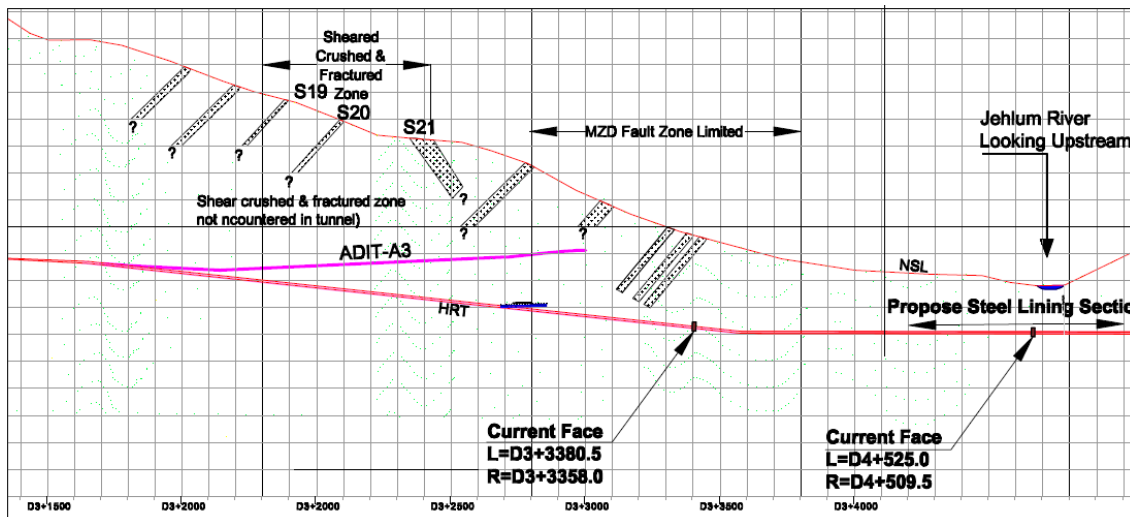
Face location at Muzaffarabad fault and Jhelum crossing
